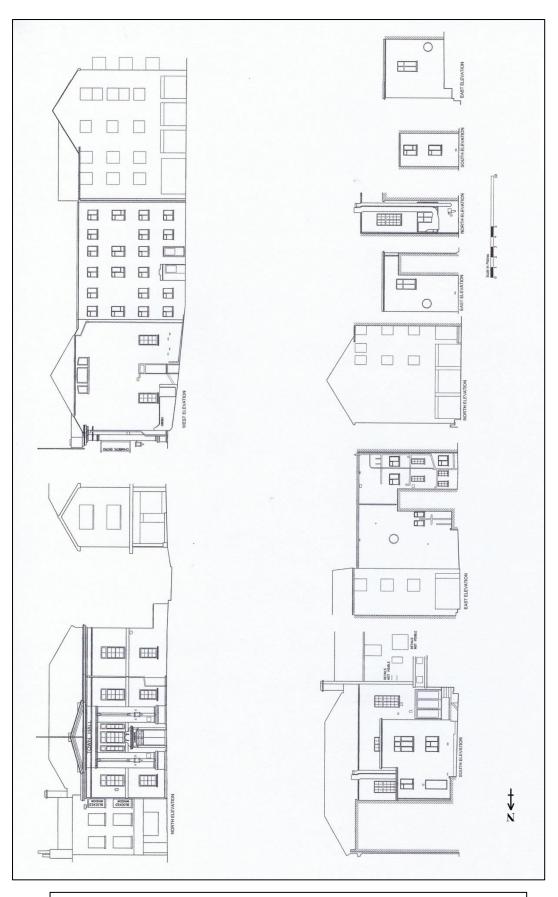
Shoreham Town Hall: Elevations and Sections Adapted from architects drawing
